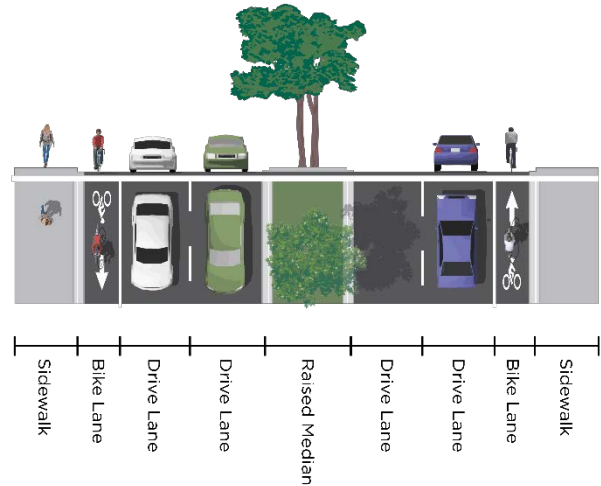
Potential San Pablo Avenue Cross Section - Road 20 to Rumrill Boulevard
